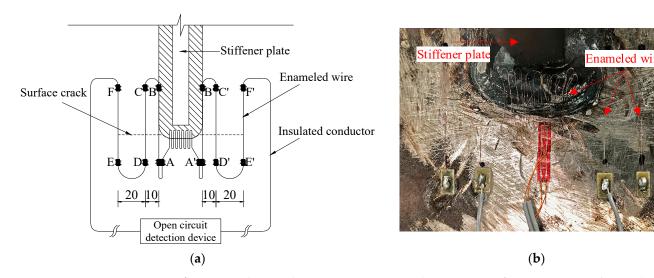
Surface crack monitoring (a) Control circuit (mm) (b) Arrangement of enameled wires at the end weld.
